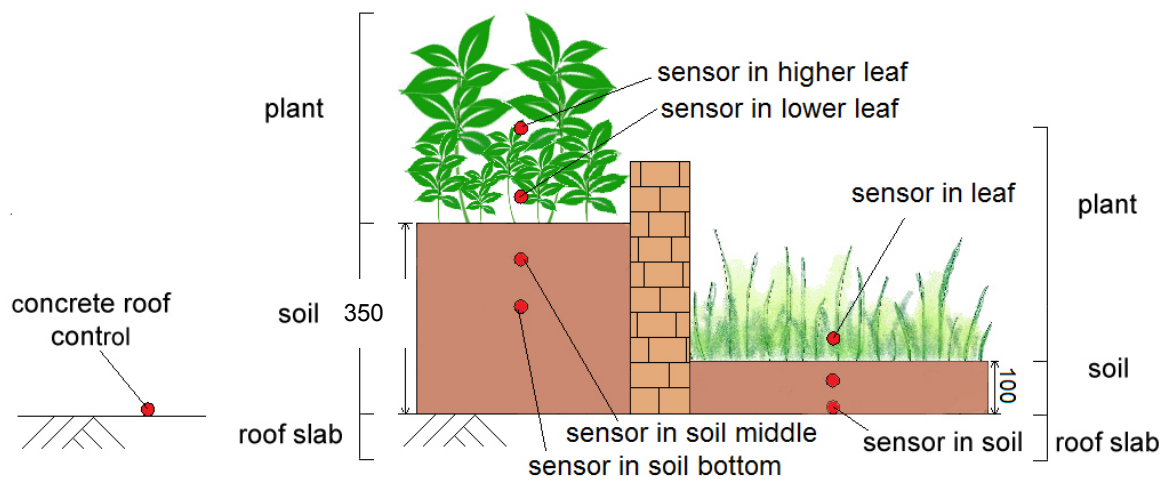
Section and sensor positions of the roof garden of YLGPS
